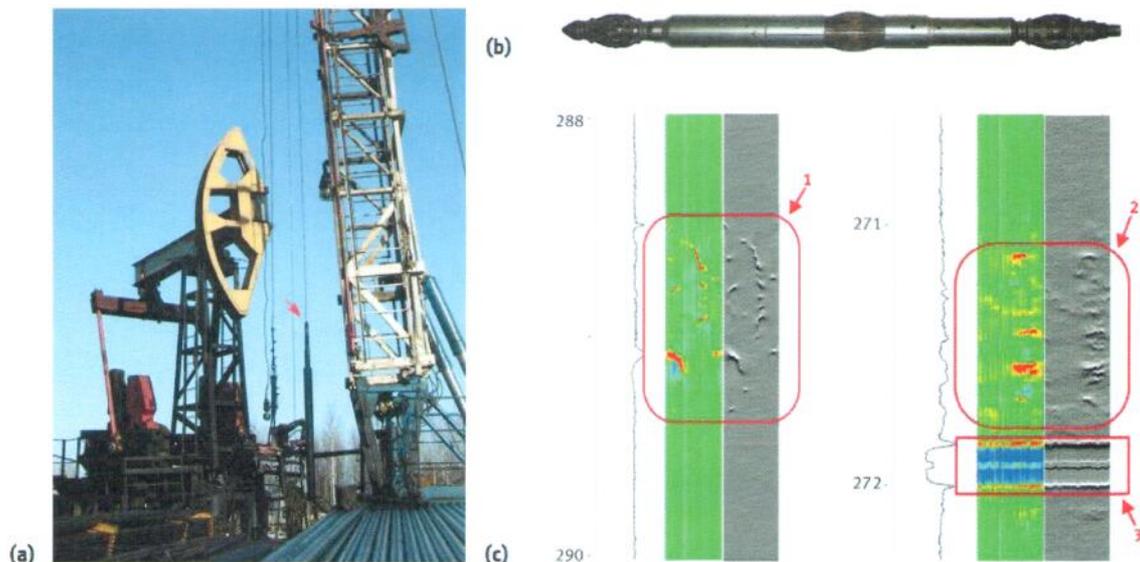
NDT of an oil well pipe casing by the INTROSCOPE tool (a) the tool (denoted by an arrow); (b) the tool view; (c) data records showing: 1-corrosion damage of casing external surface; 2- corrosion damage of casing internal surface and 3- perforation.
